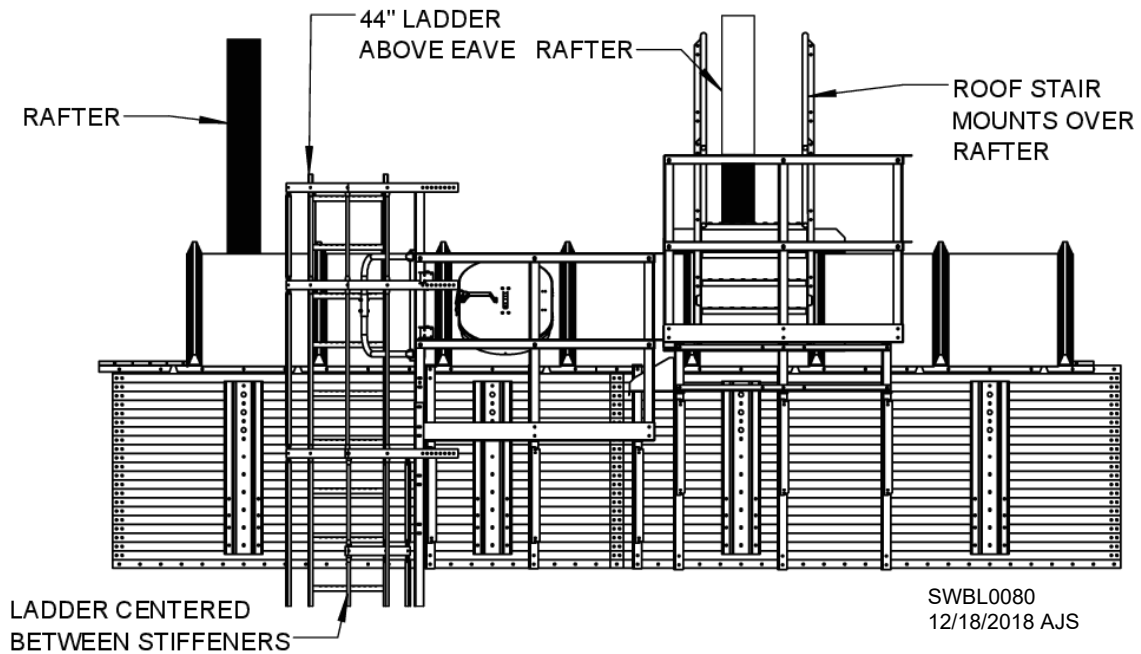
Ladder & platform locations with 2 stiffeners & 4 roof sheets per sidewall sheet
